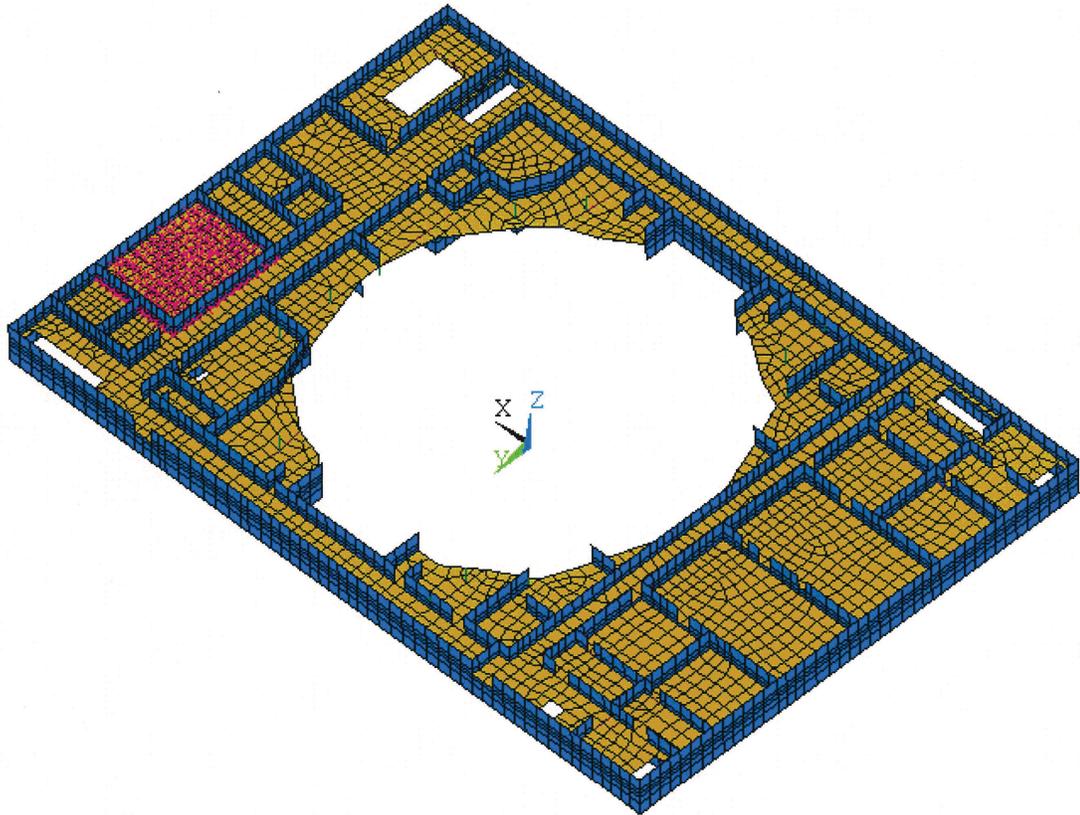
Extracted Detailed FE Model of Floor Slabs
